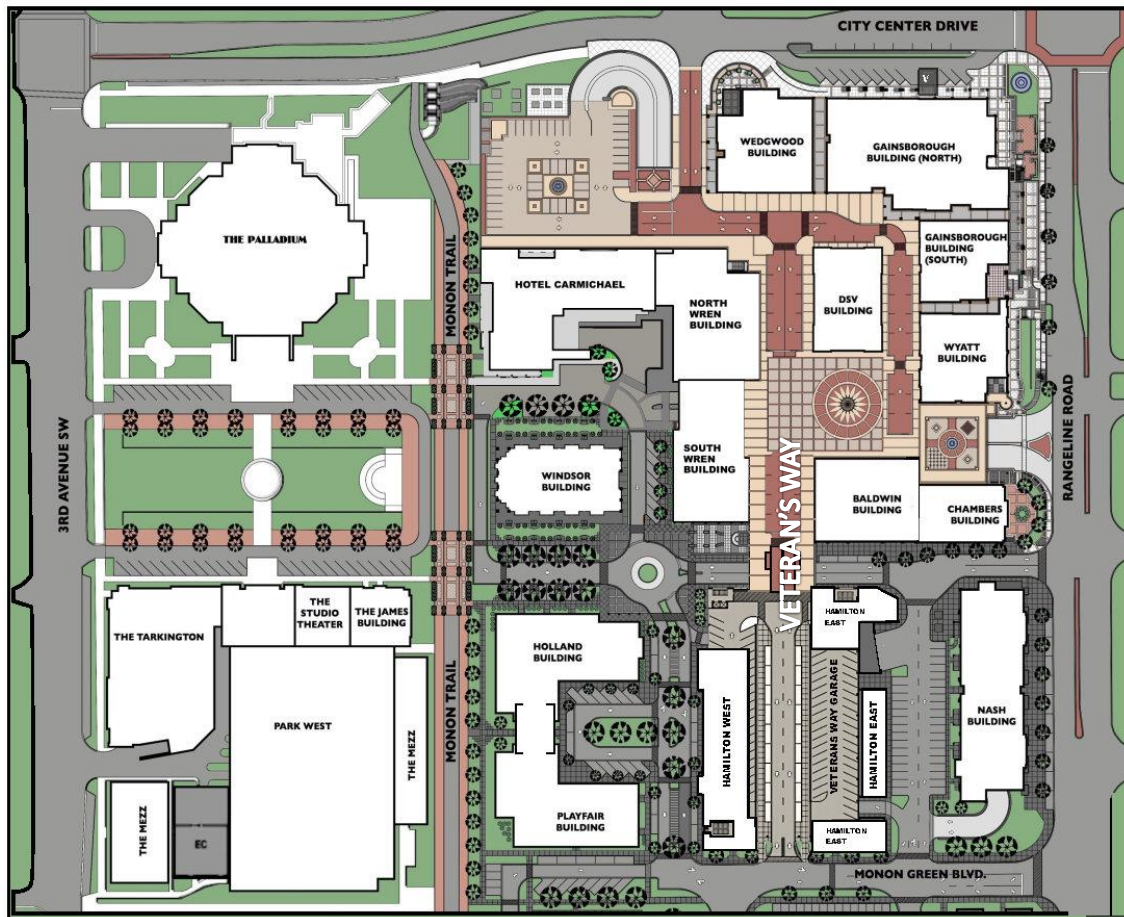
City Center Master Plan, provided by Pedcor City Center Development Company
